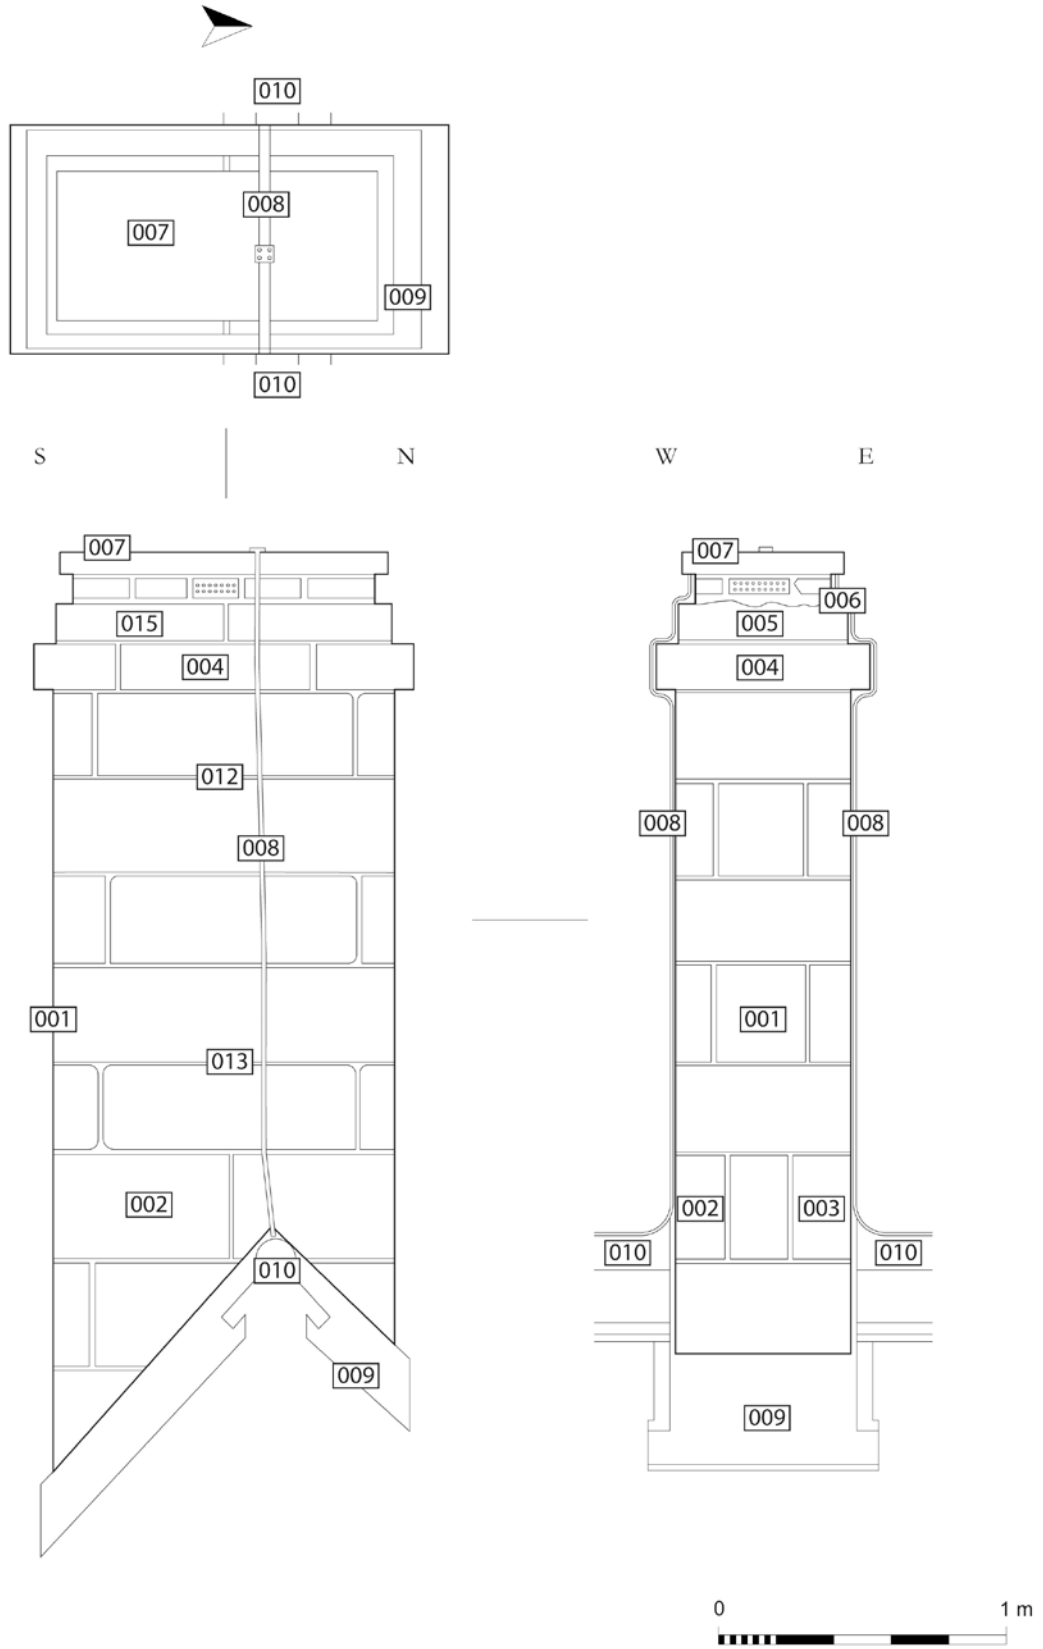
Chimney RC08 plan (top), eastern elevation (left), and southern elevation.
